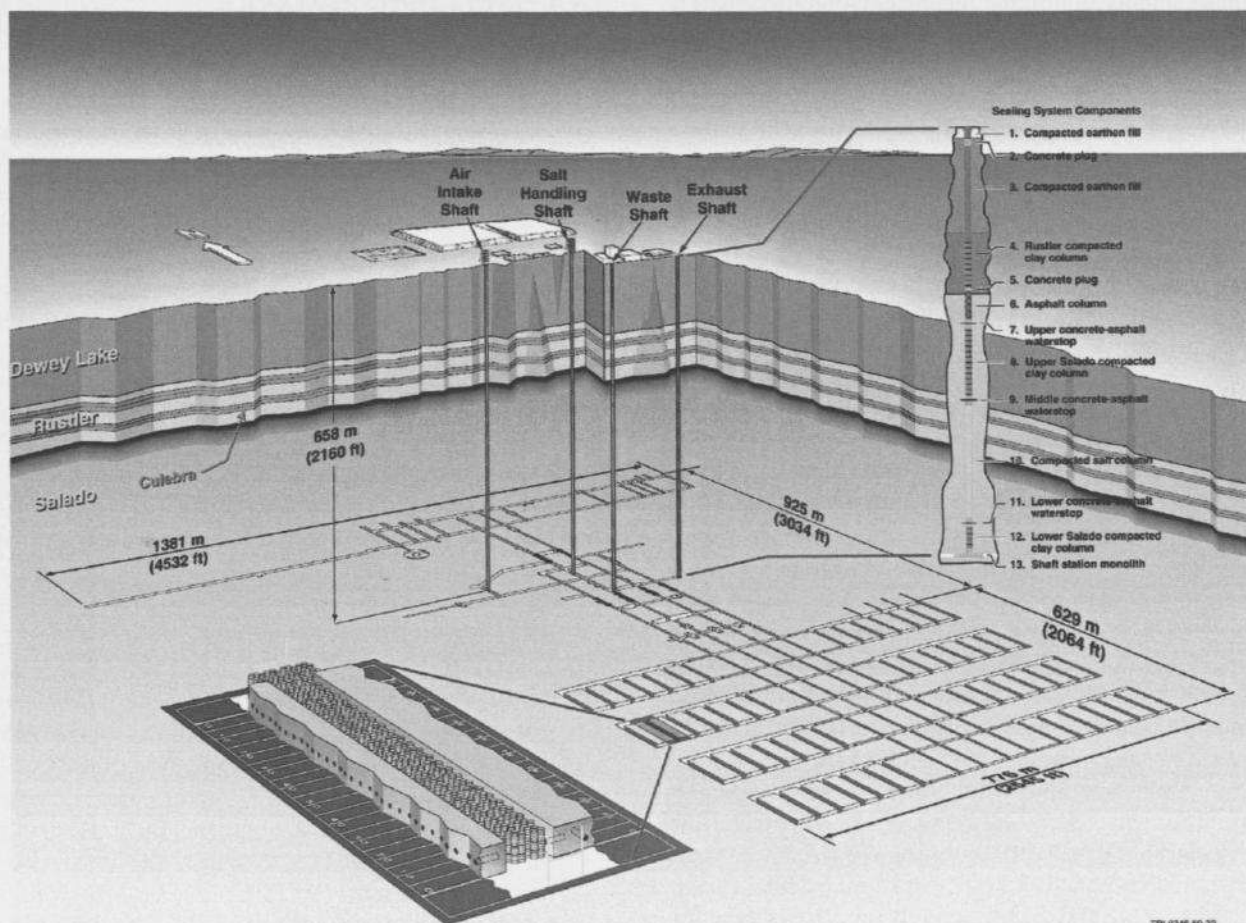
Isometric view of the WIPP, showing shaft sealing components.
